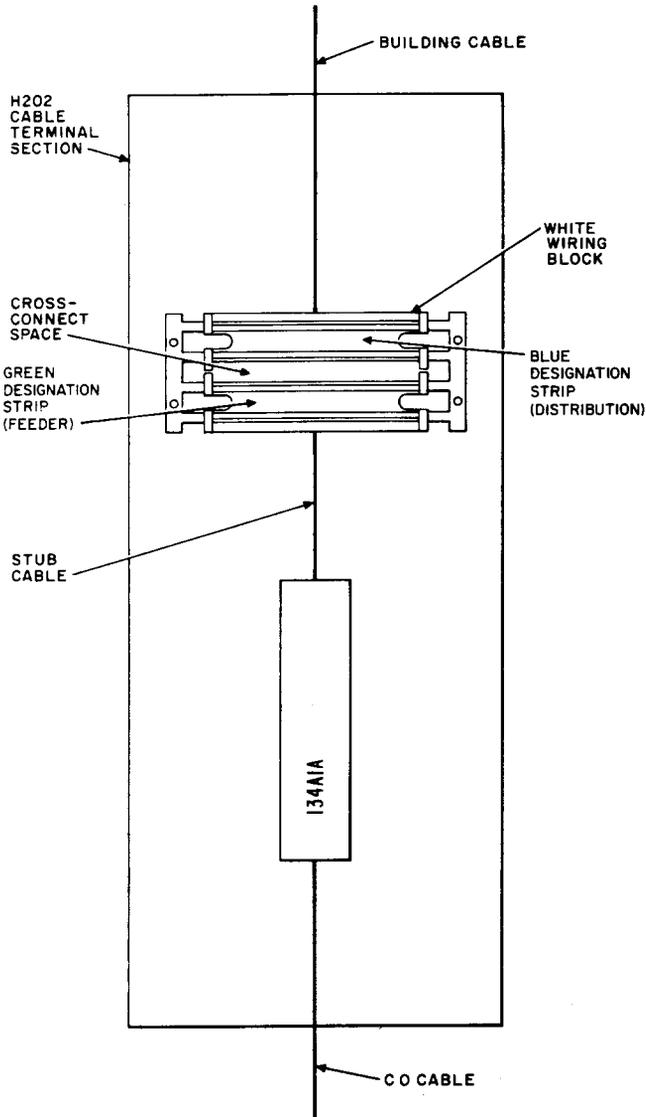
Entrance Cable and Building Cable Terminating on One Wiring Block
